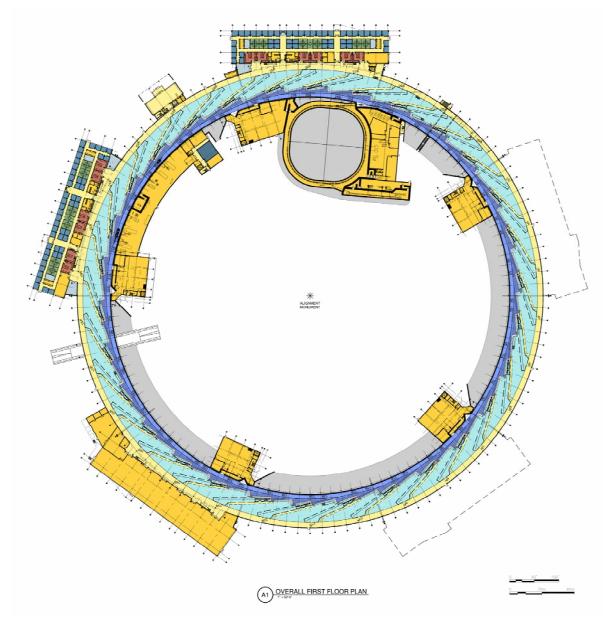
NSLS-II Complex Layout – First Floor Plan.
